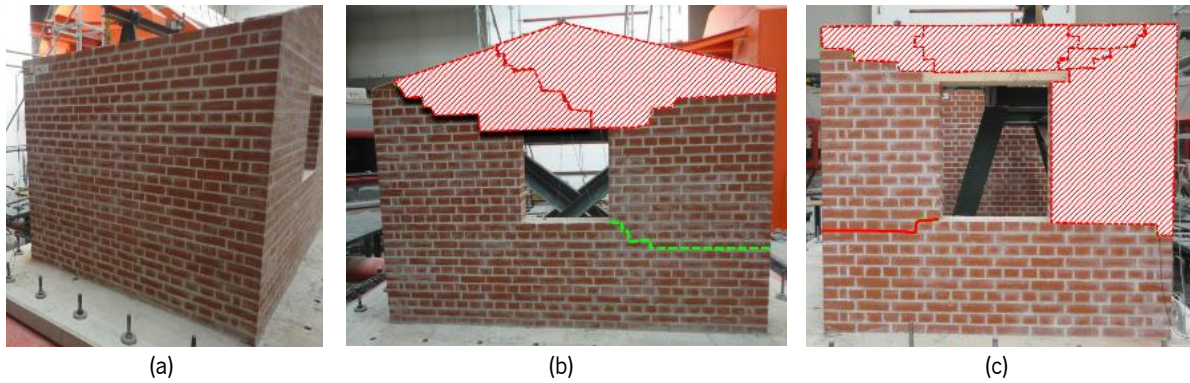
Collapse mechanisms of the brick masonry prototype from shaking table tests: (a) return wall without opening, (b) main gable wall, and (c) return wall with window opening
